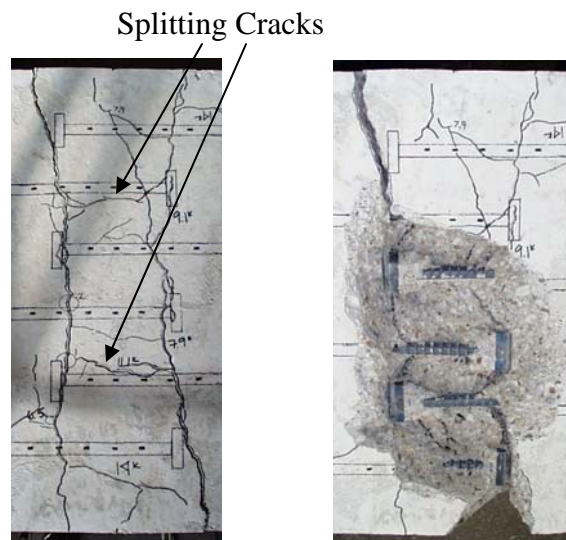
Failure of Specimen ULS-#8-4.7R-6S-5
